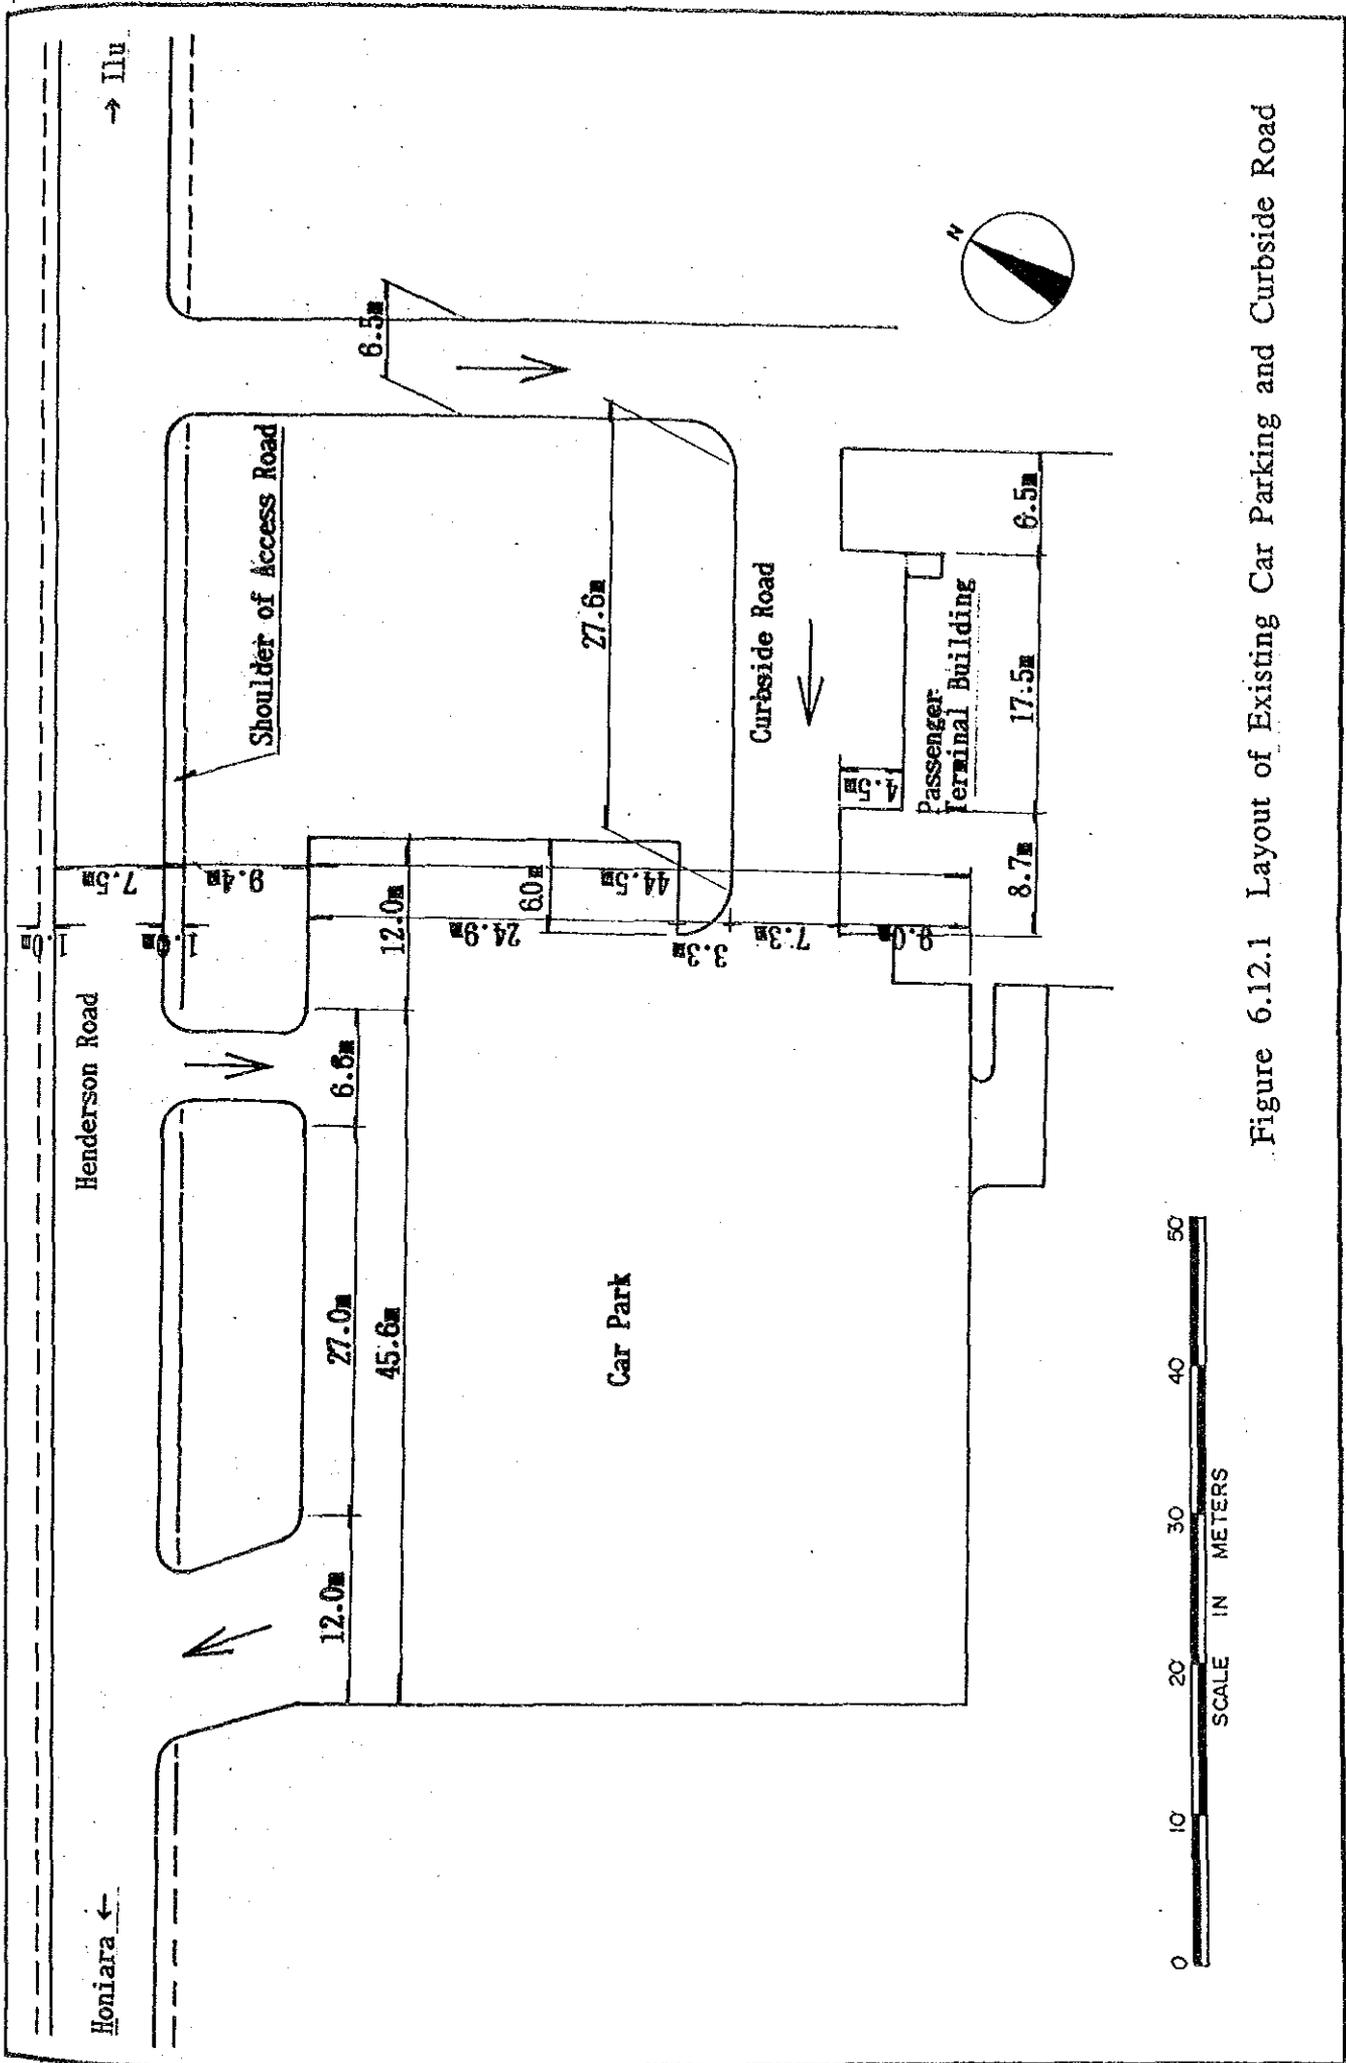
Layout of Existing Car Parking and Curbside Road
